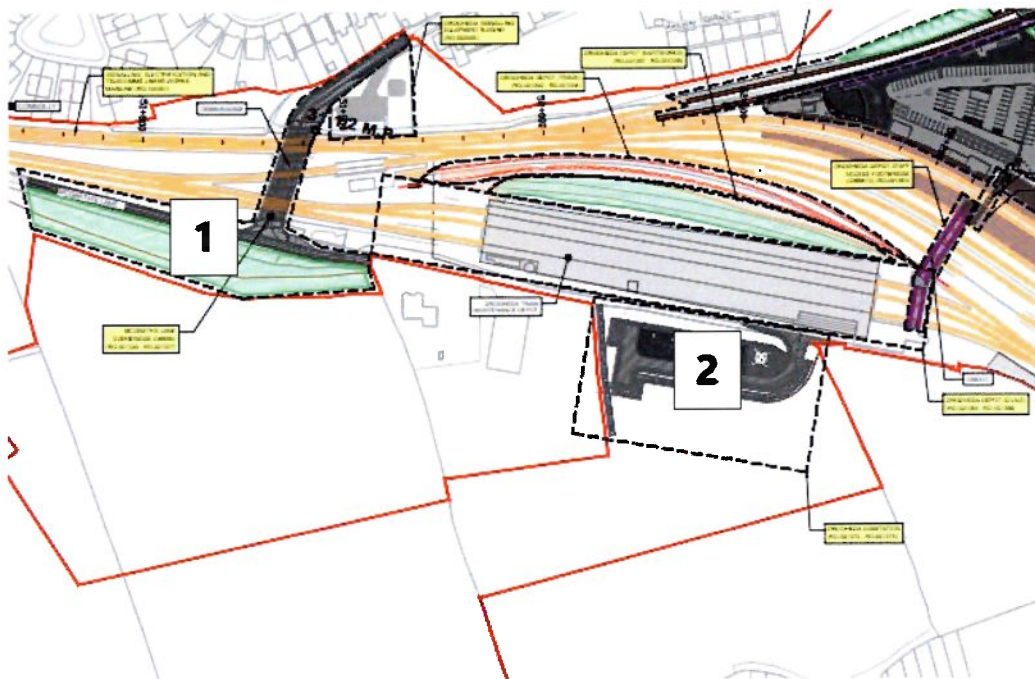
Extract from Drogheda MacBride Works Layout Plan
